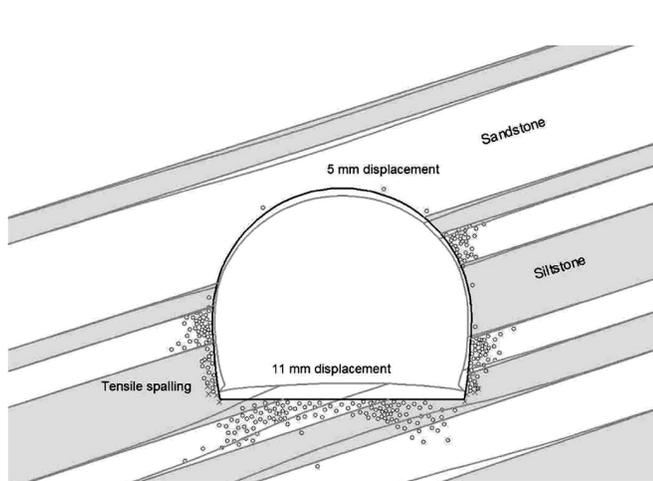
Tensile failure in sandstone and siltstone molasse surrounding an unsupported tunnel.
